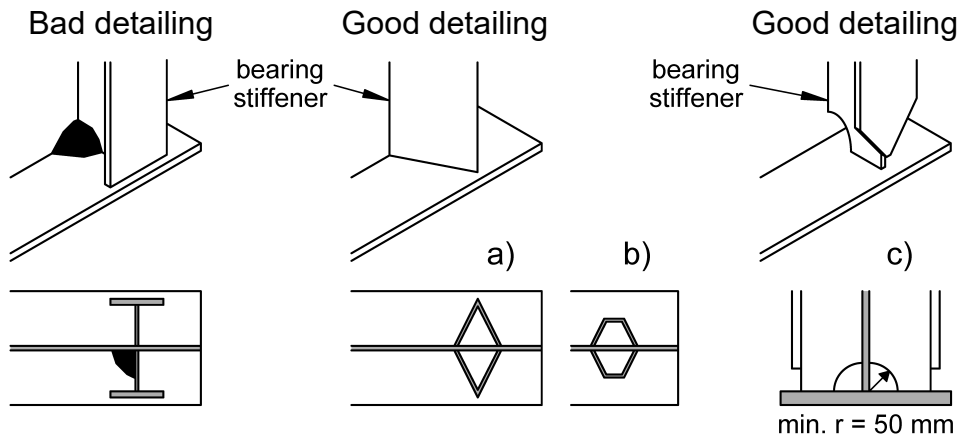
Optimum choice of transverse bearing stiffener shape a) triangular stiffener, b) trapezoidal stiffener, c) drainage passes with a minimum cope radius of 50 mm
